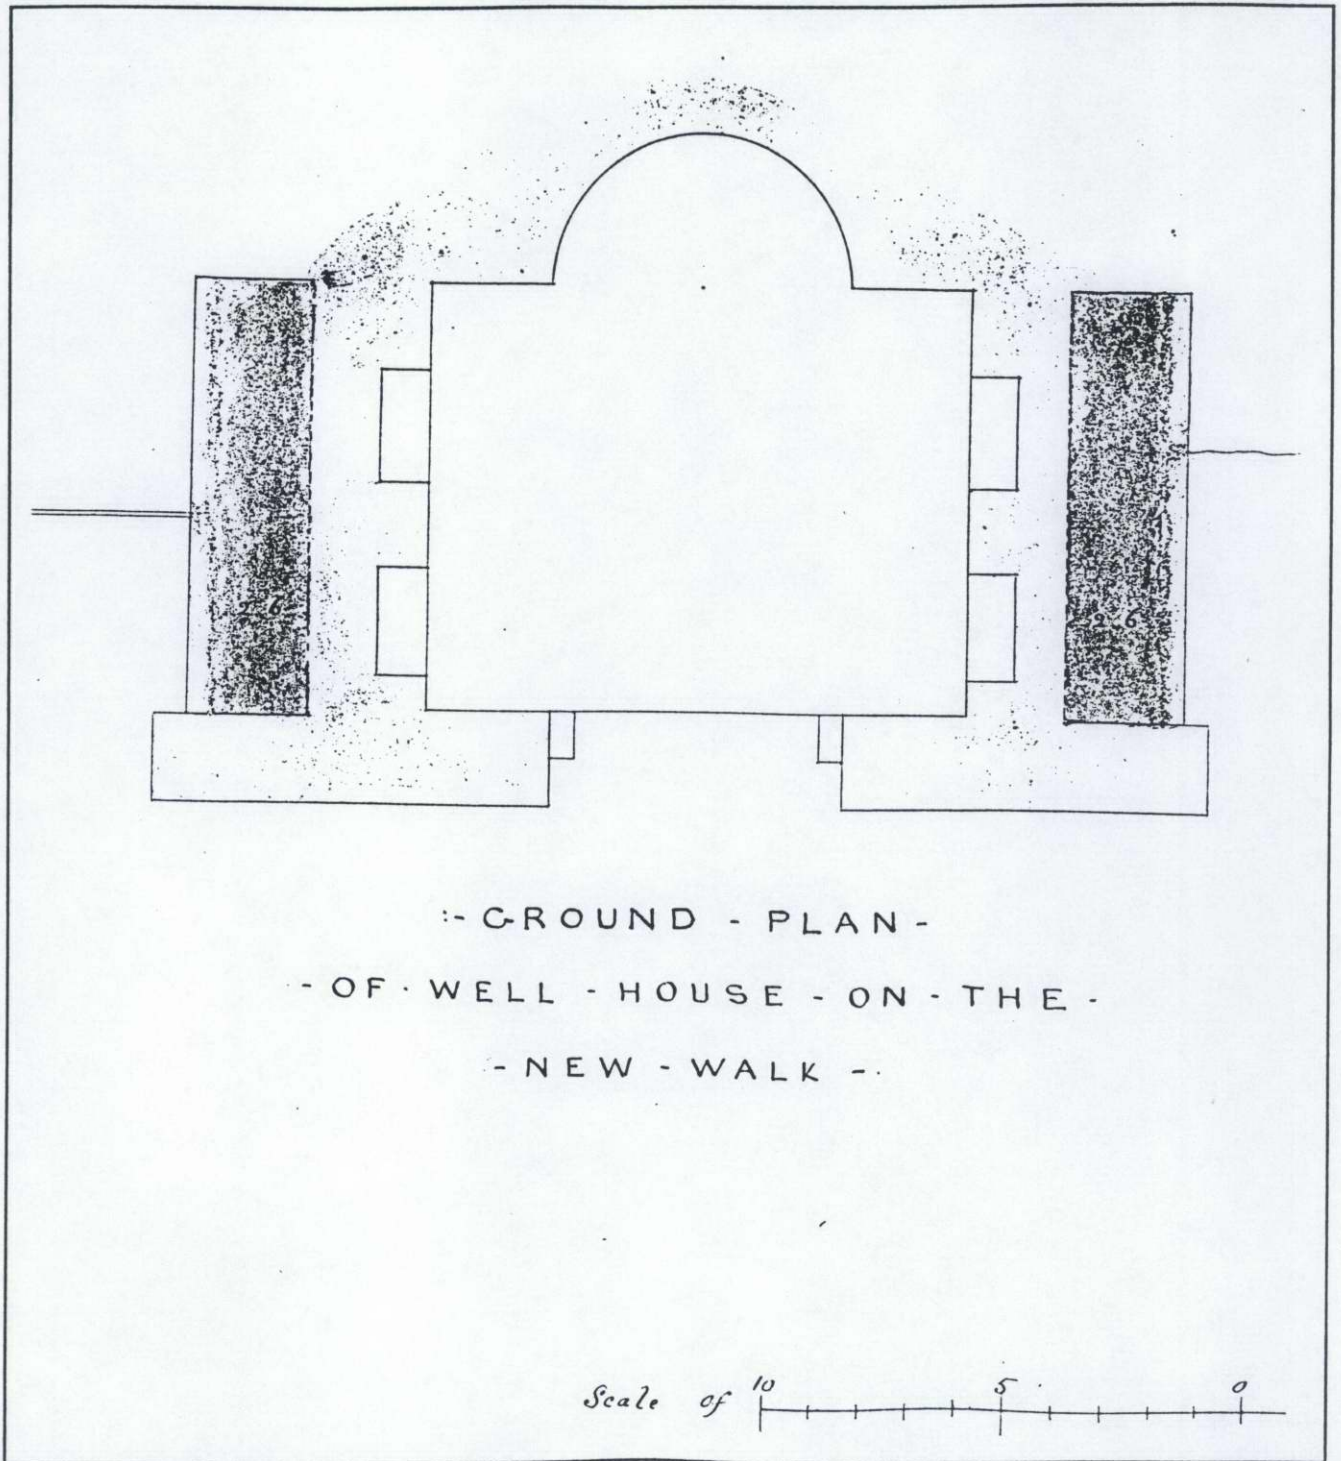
Ground plan of Pikeing well by Thomas Pickersgill 1858
